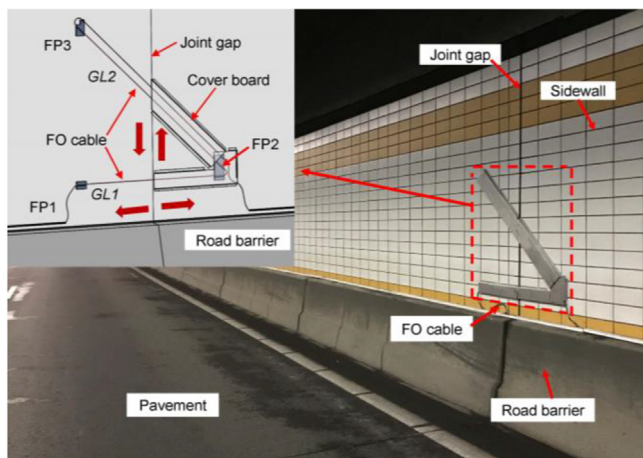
Monitoring immersed tunnel joint deformation using DFOS in the Heineoordtunnel.
